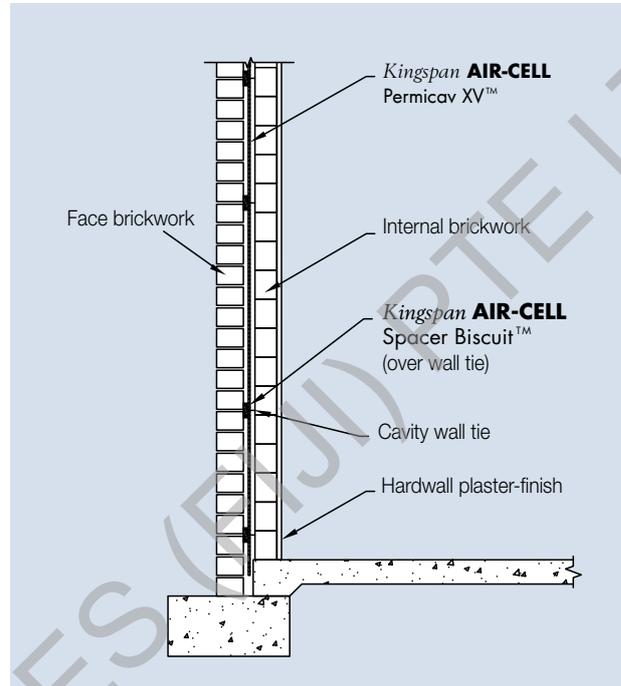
Side elevation of Kingspan AIR-CELL Permicanv XV™ in double brick cavity wall
